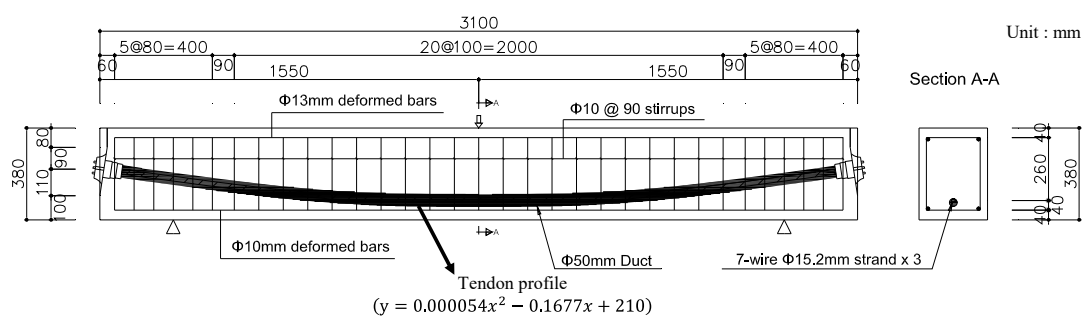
Detailed drawing of the prestressed concrete (PC) beam specimens.
